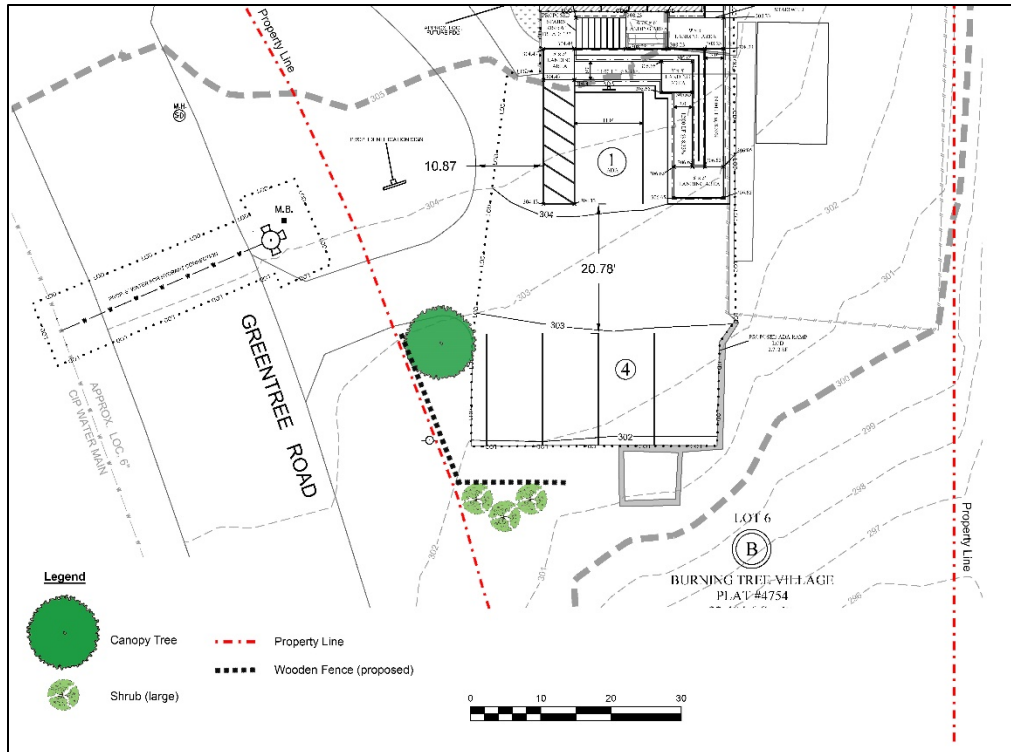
Proposed Vegetative Screening of Parking Accessed from Greentree Road
